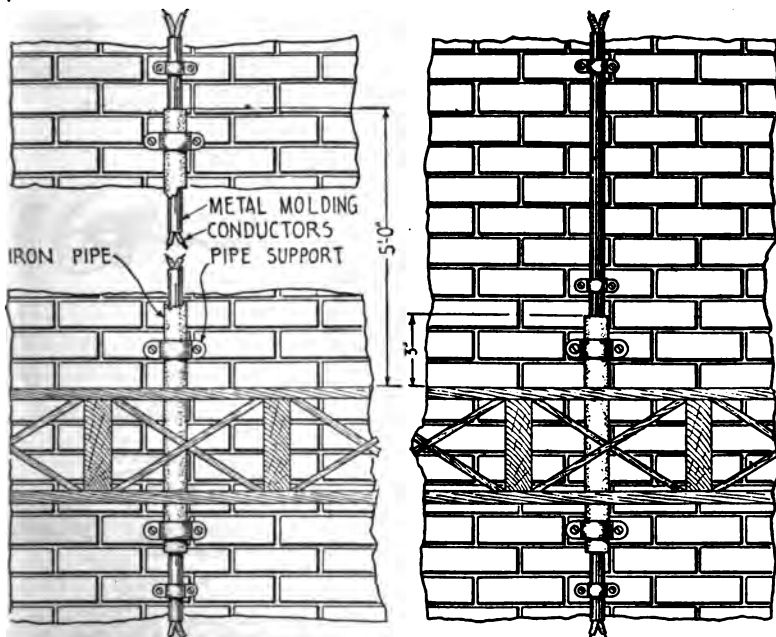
,020 to 7,022.—Method of running metal moulding around beams.
